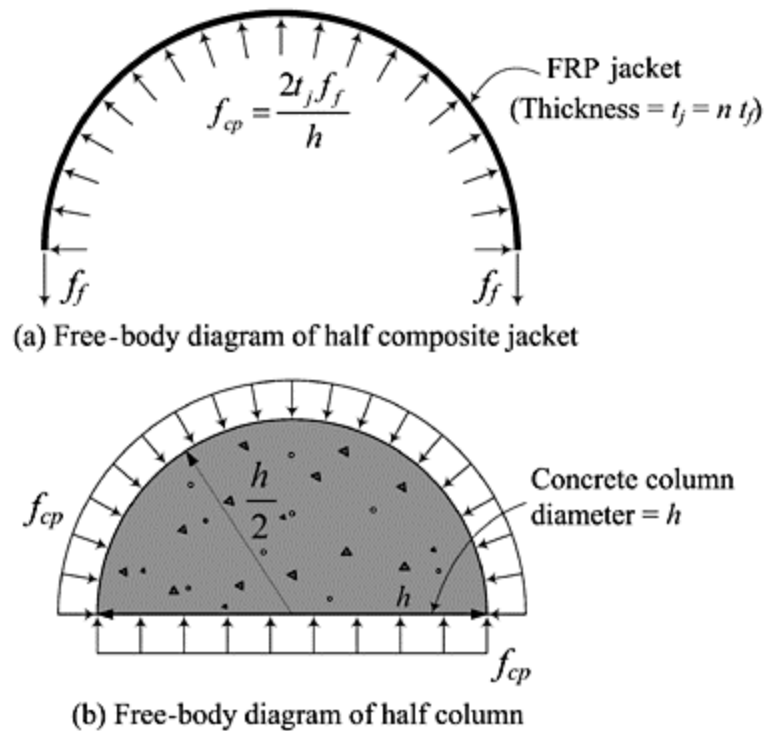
Free-body diagram showing the internal and external forces on the FRP jacket and concrete column. (Source: Master Builders, Inc. and Structural Preservation Systems, 1998).
